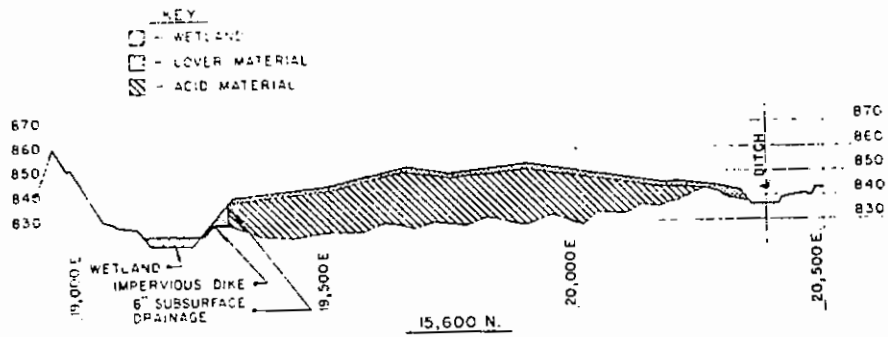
Post-reclamation cross section of Robinson Branch site showing position of wetland, dike and subsurface drain.
